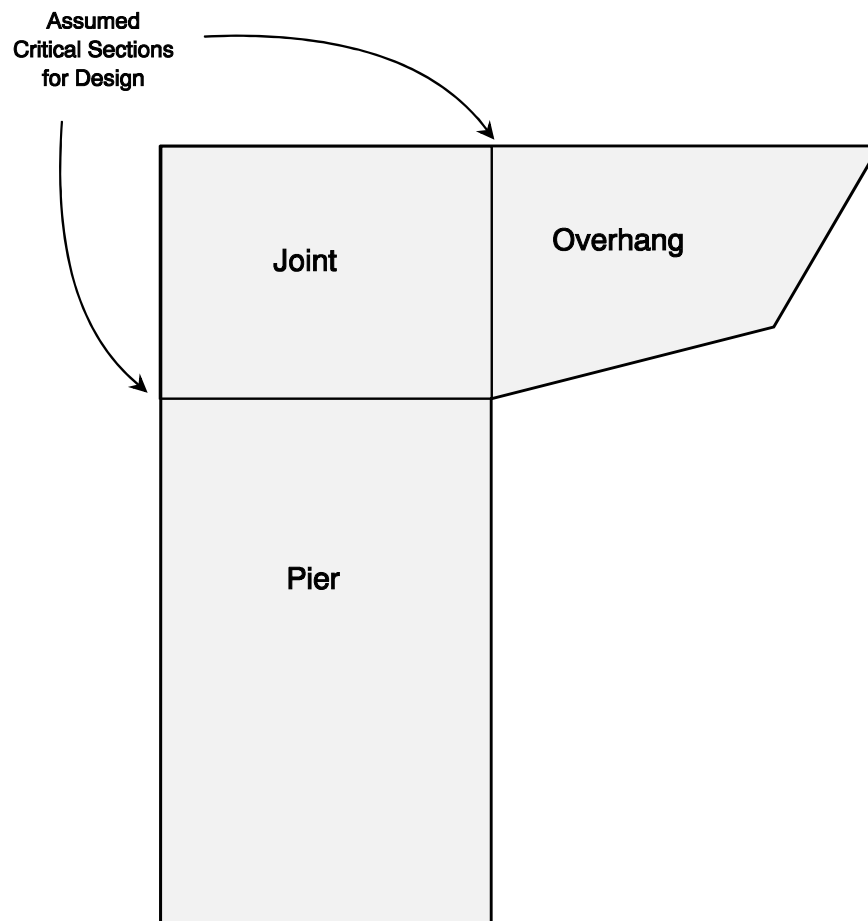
Schematic of Pier, Overhang, and Joint Regions in Cantilever Bent, Showing Assumed Critical Sections for Original Design
